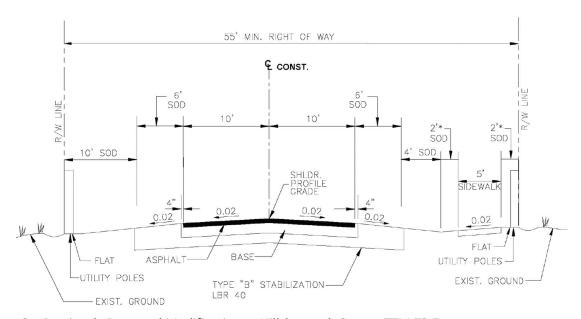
Previously Proposed Modification to Hillsborough County TTM TS-7
